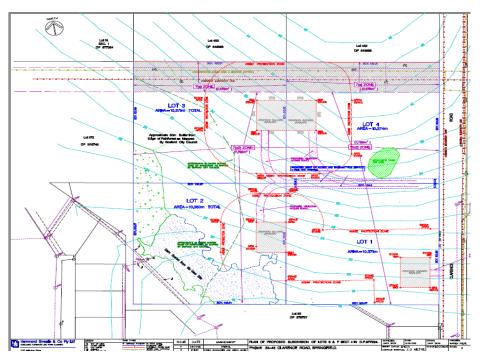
Proposed Subdivision and Extent of APZs for Dwellings
